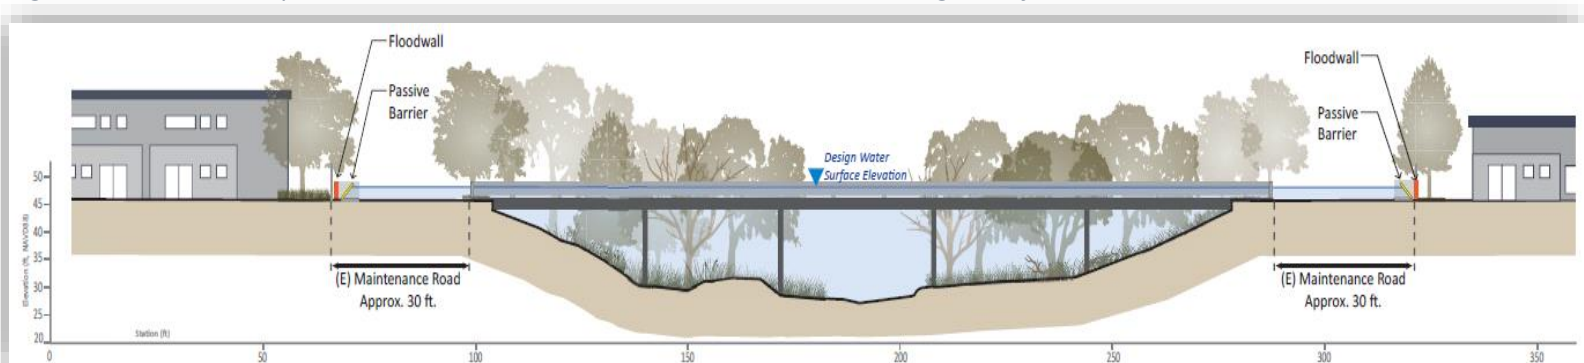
Reach 4 – Option B Cross-section: Passive barriers at Charcot Avenue bridge and floodwalls
